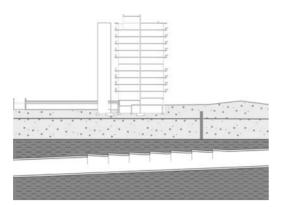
Crossing the building Werner-Friedmann-Bogen, longitudinal section.
